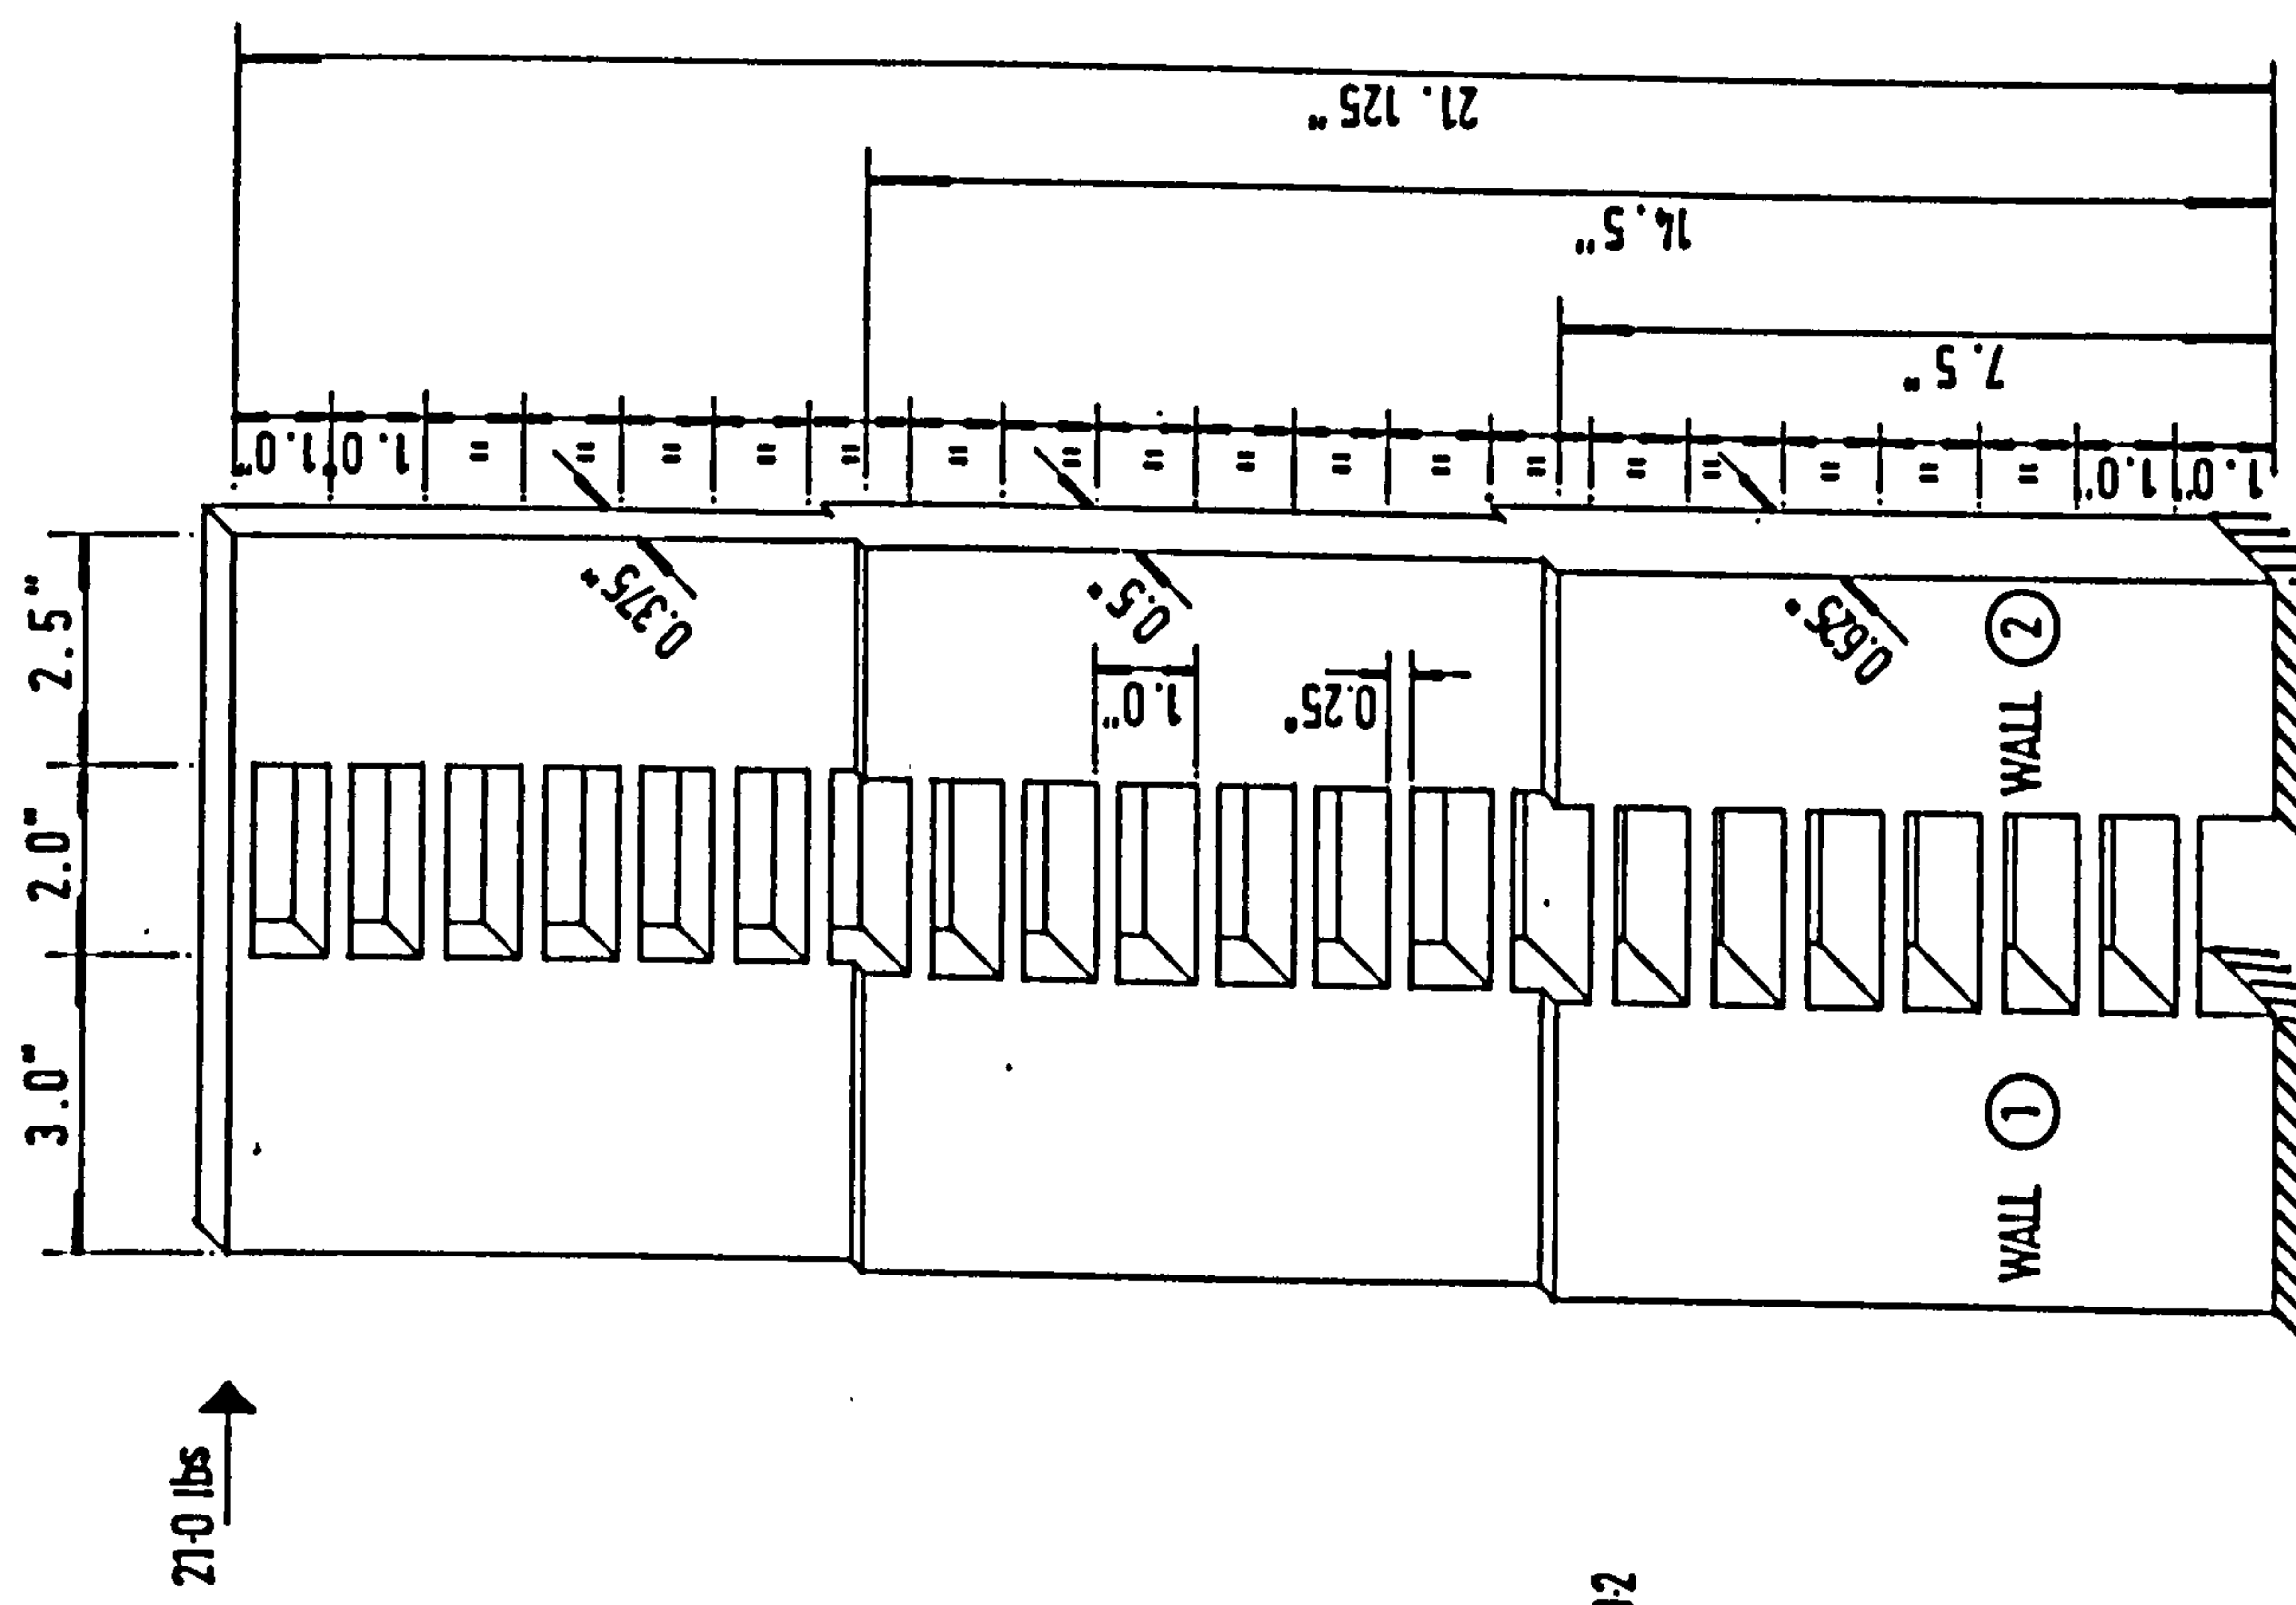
COUPLED SHEAR WALL MODEL (8)
